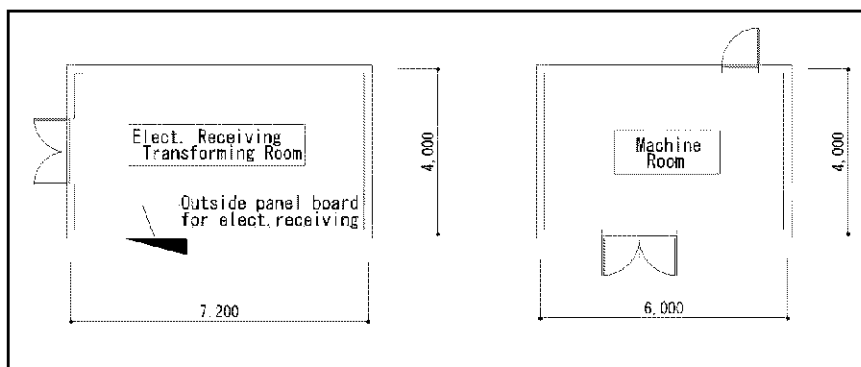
(22) Layout for Electricity and Machine Rooms
